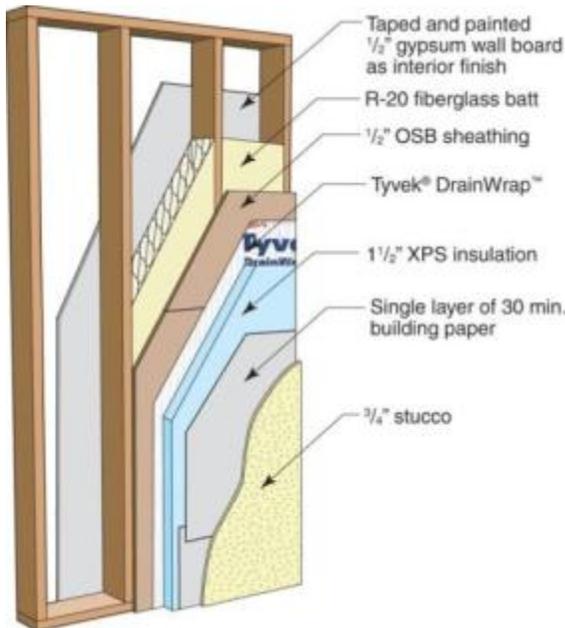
Exterior insulated wall on all four orientations (Wall A)
